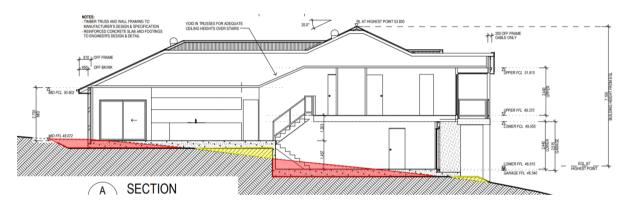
Annotated Section A detailing in red excavation and in yellow fill
